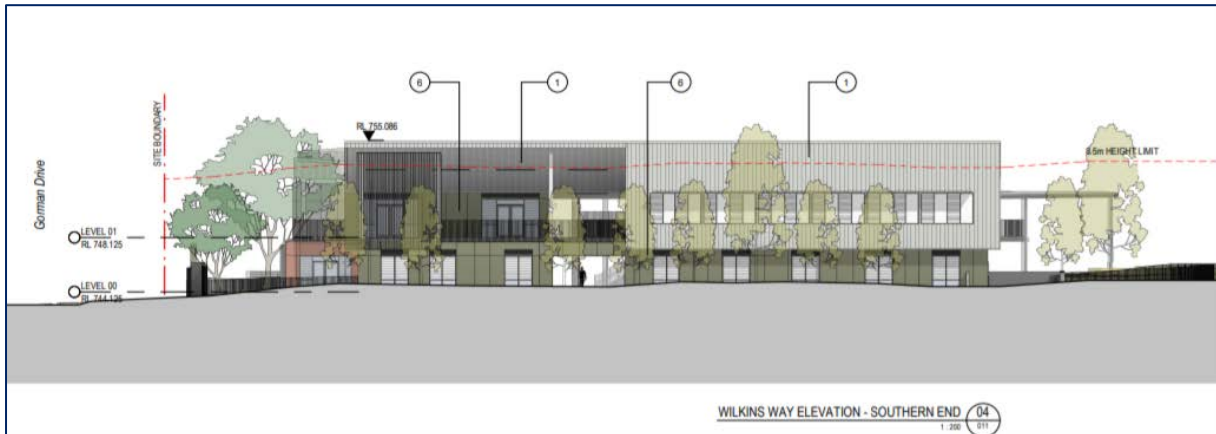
| Eastern elevation (Wilkins Way) (Source: Applicant's RtS 2021)
